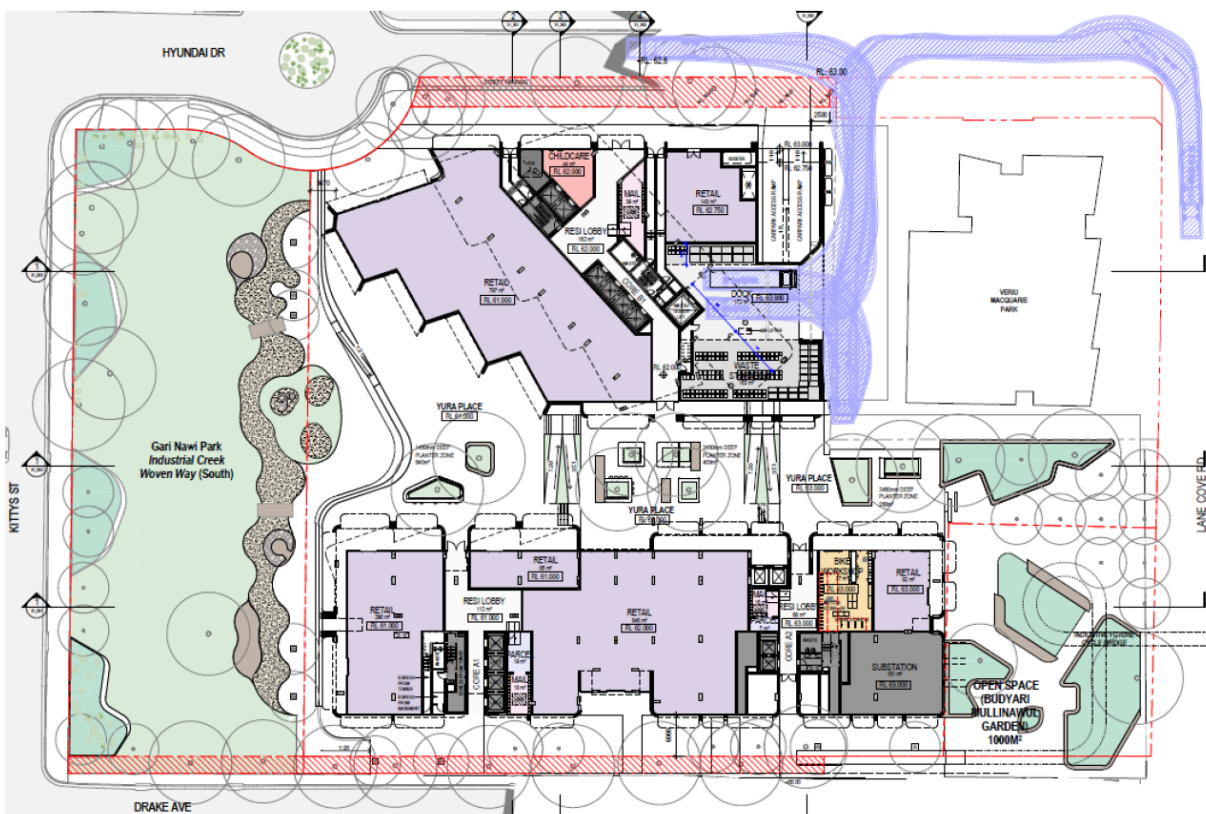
Proposed floor plan – Giffnock Ave, Macquarie Park Mixed Use Development
